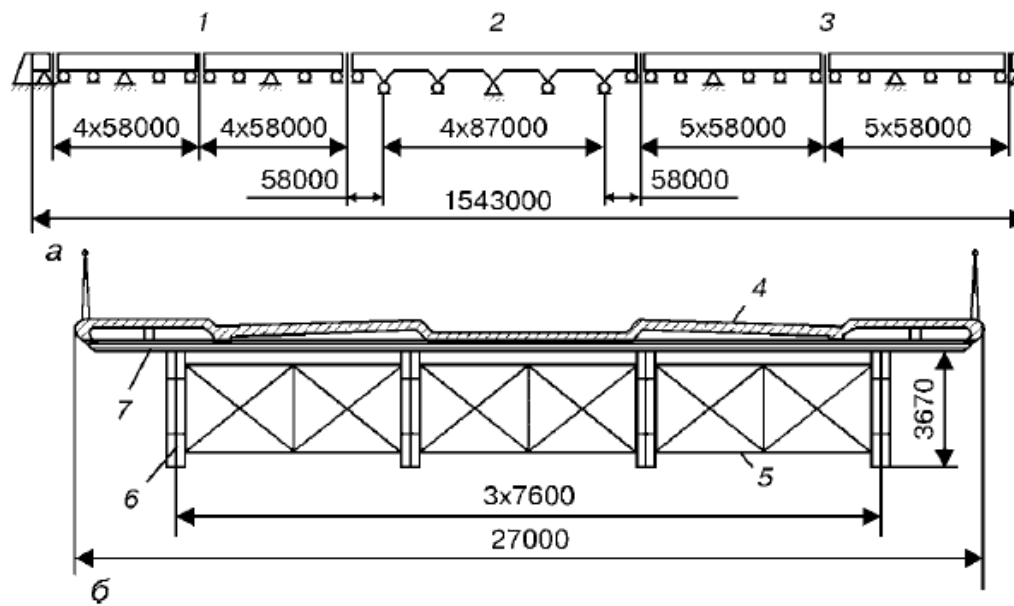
General scheme (a) and cross section (b) of the Evgeny Paton Bridge across the Dnipro river in Kyiv: 1 - left-bank area (two continuous four-span stiffening beams); 2 - middle area (the same, one six-span girder); 3 - right-bank area (the same, two six-span girders); 4 - reinforced-concrete plate of passageway; 5 - transverse braces between principal beams; 6 - principal welded I-beam with a solid wall; 7 - transverse rolled I-beam (Lobanov, Kyrian, & Shumitsky, 2003).
